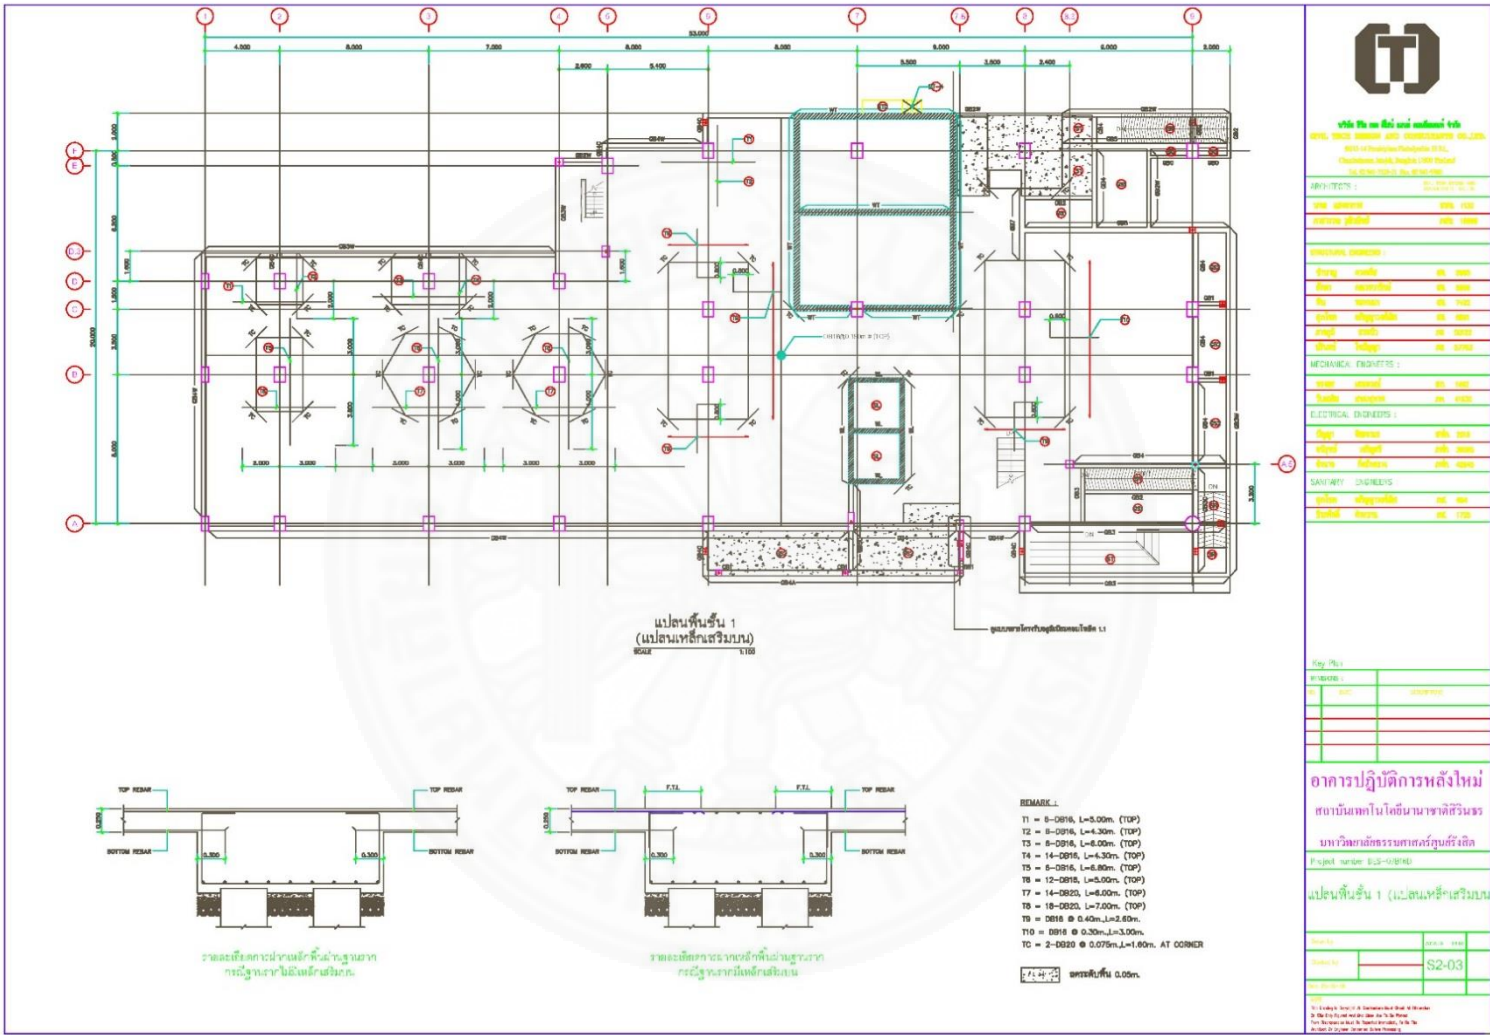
Reinforcement layout drawing of top steel on beam and foundation
